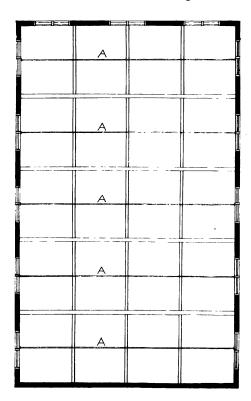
Typical Apparatus Pipe Frame as applied to a Gymnasium in which the ceiling girders exceed the allowable maximum height for suspended apparatus.
